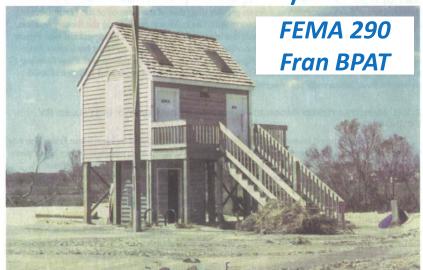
Survival of this properly elevated NC State Park public restroom demonstrates the State's commitment to proper construction in coastal areas.
